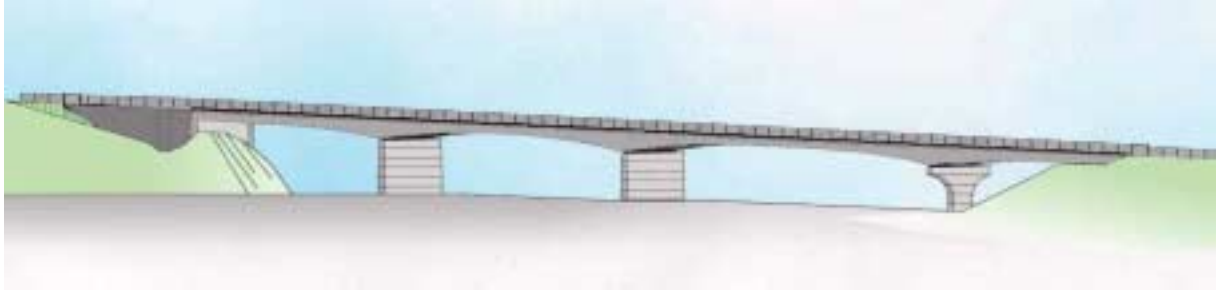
Elevation of Completed Bridge for Cut and Slide Option
